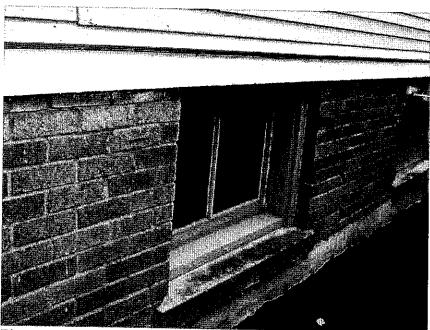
Typical wood basement window on north, south and west elevations. A few have been modified to accomodate utilities.
